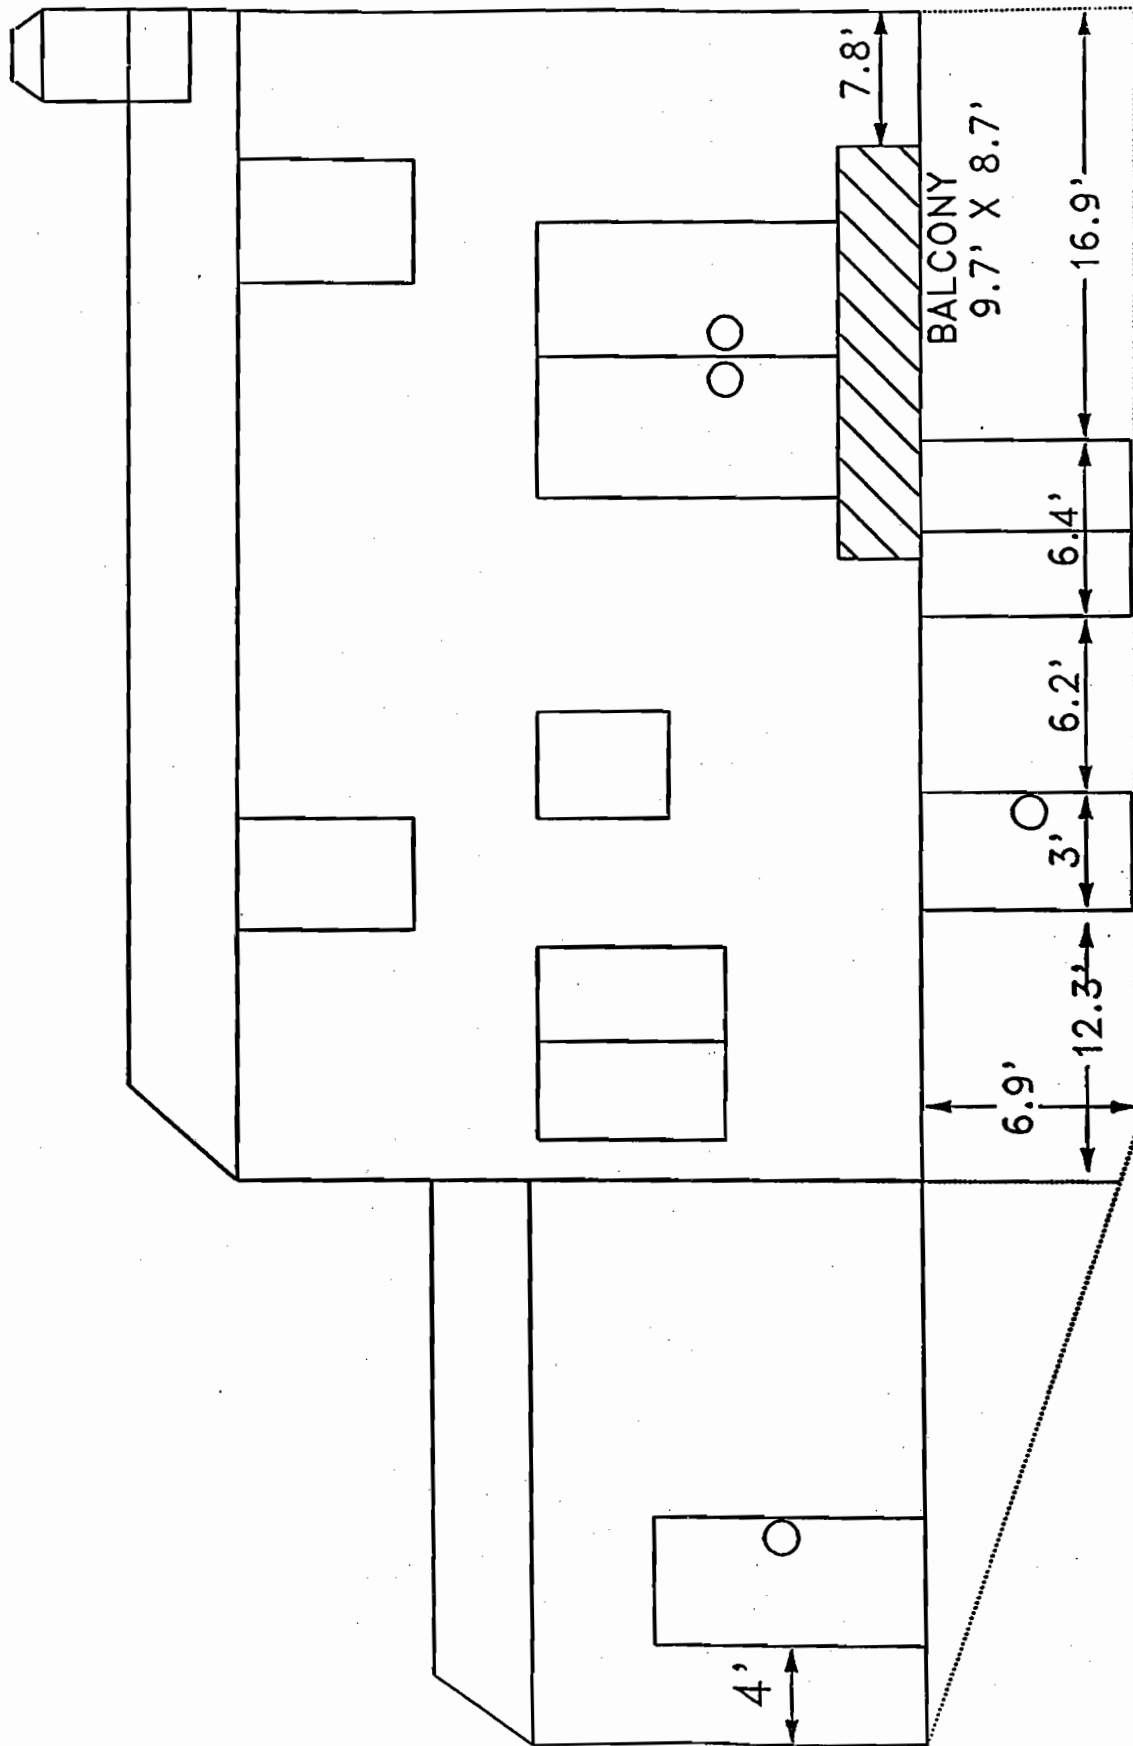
Schematic and dimensions of back elevation of the two-story house
